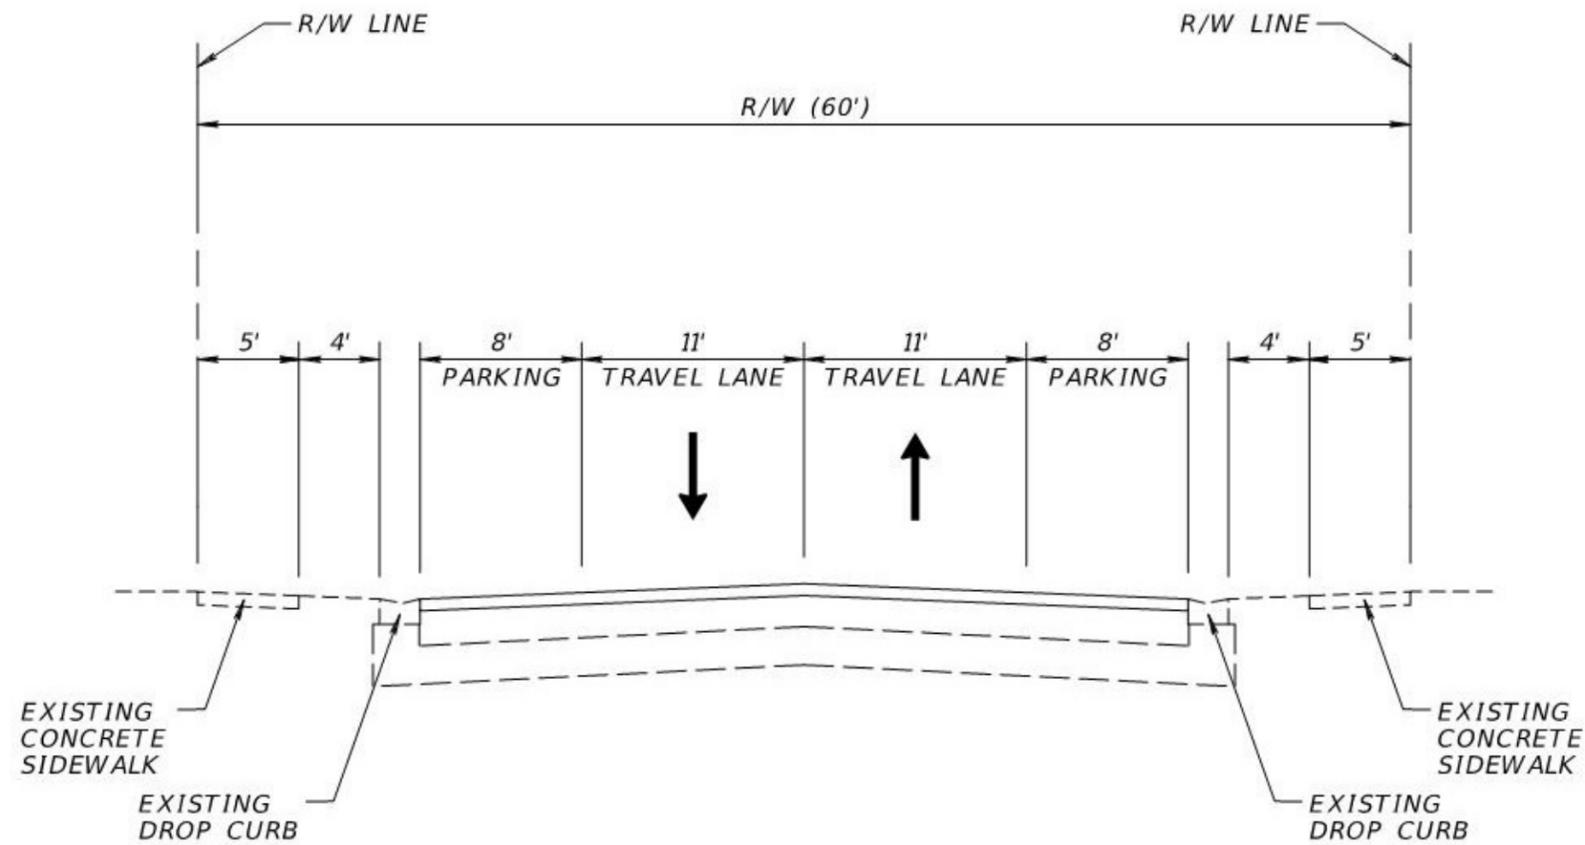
Figure G: Alcaniz Street at Wright Street – North Approach Facing South
